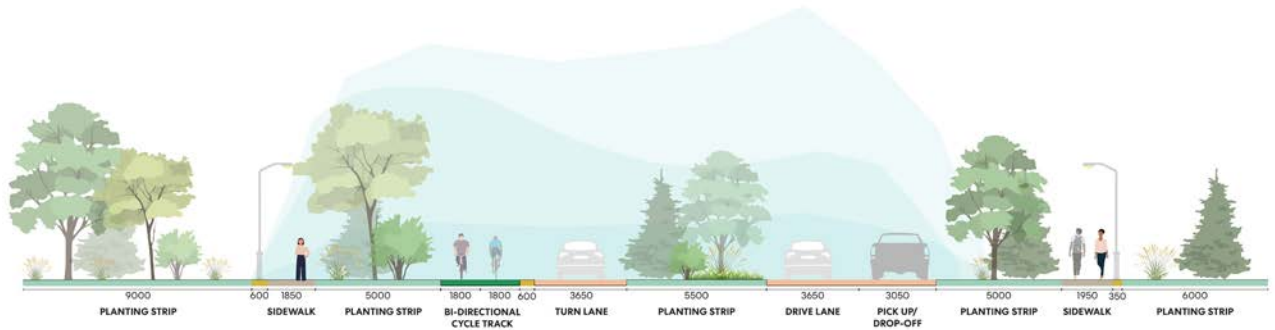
Cross Section showing Lambton Drive at FIMS Nursing Building (Facing East) – Proposed
